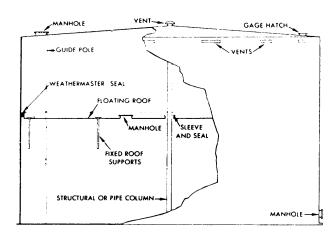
Cone Roof With Internal Floating Pan Storage Tank (Steel or Aluminum Pan) (Interior View).
